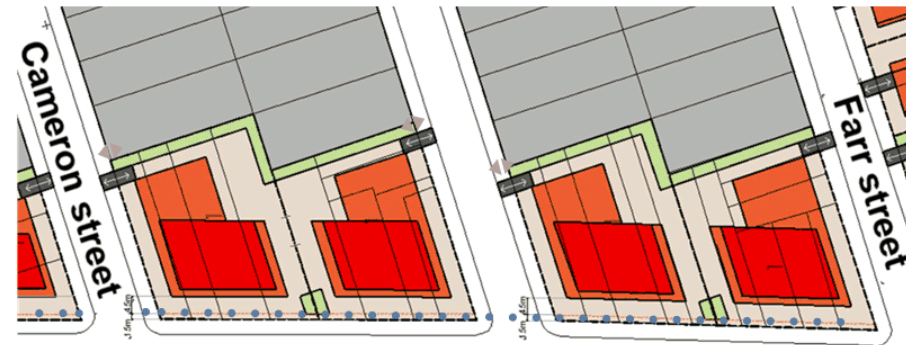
PROPOSED BUILT FORM PLAN
